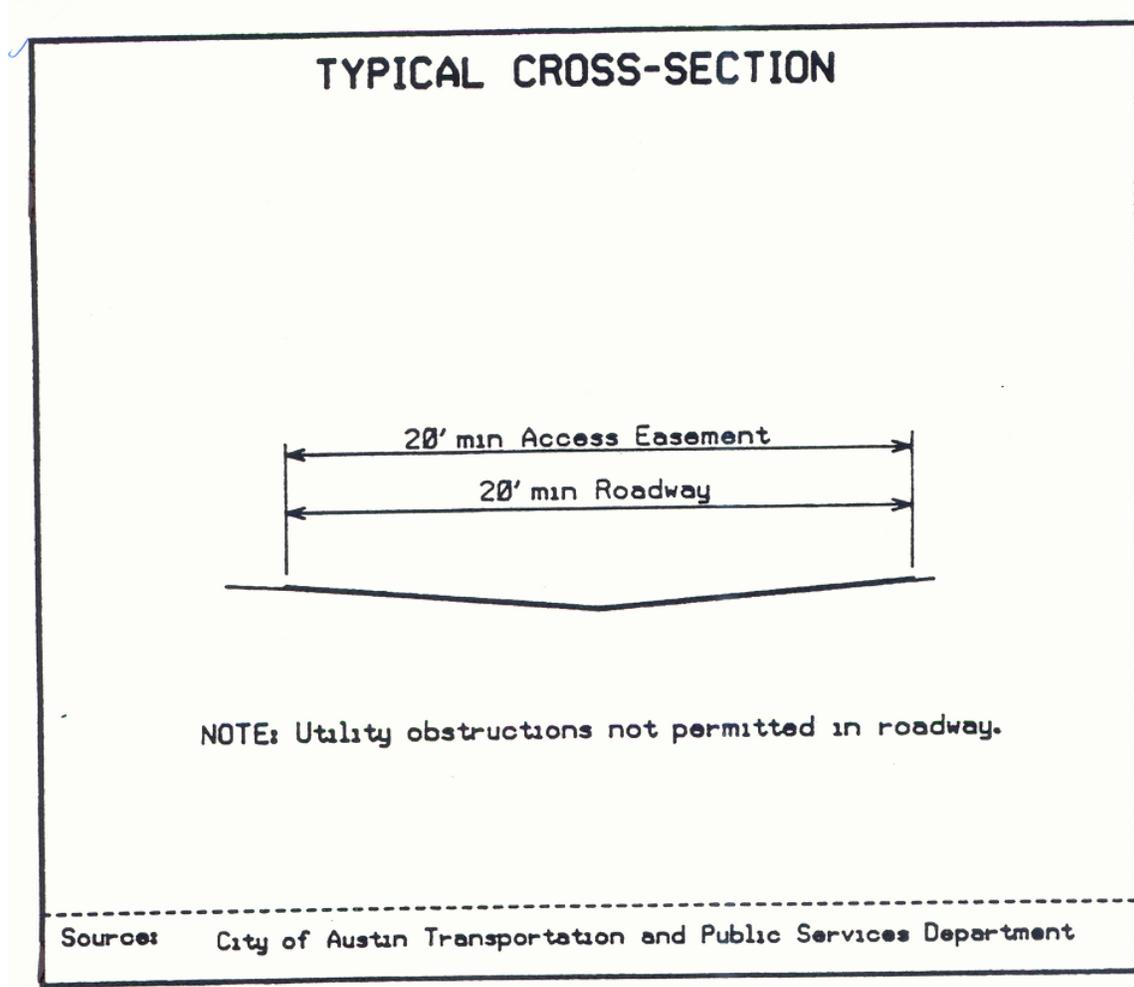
Cul-de-Sacs and Single Outlet Streets
